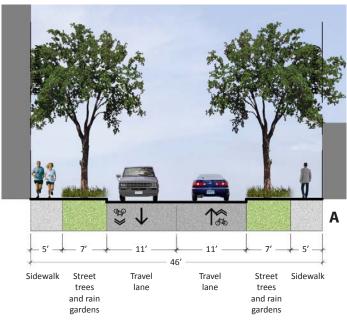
Section through Taylor Street with sidewalks and rain gardens.
